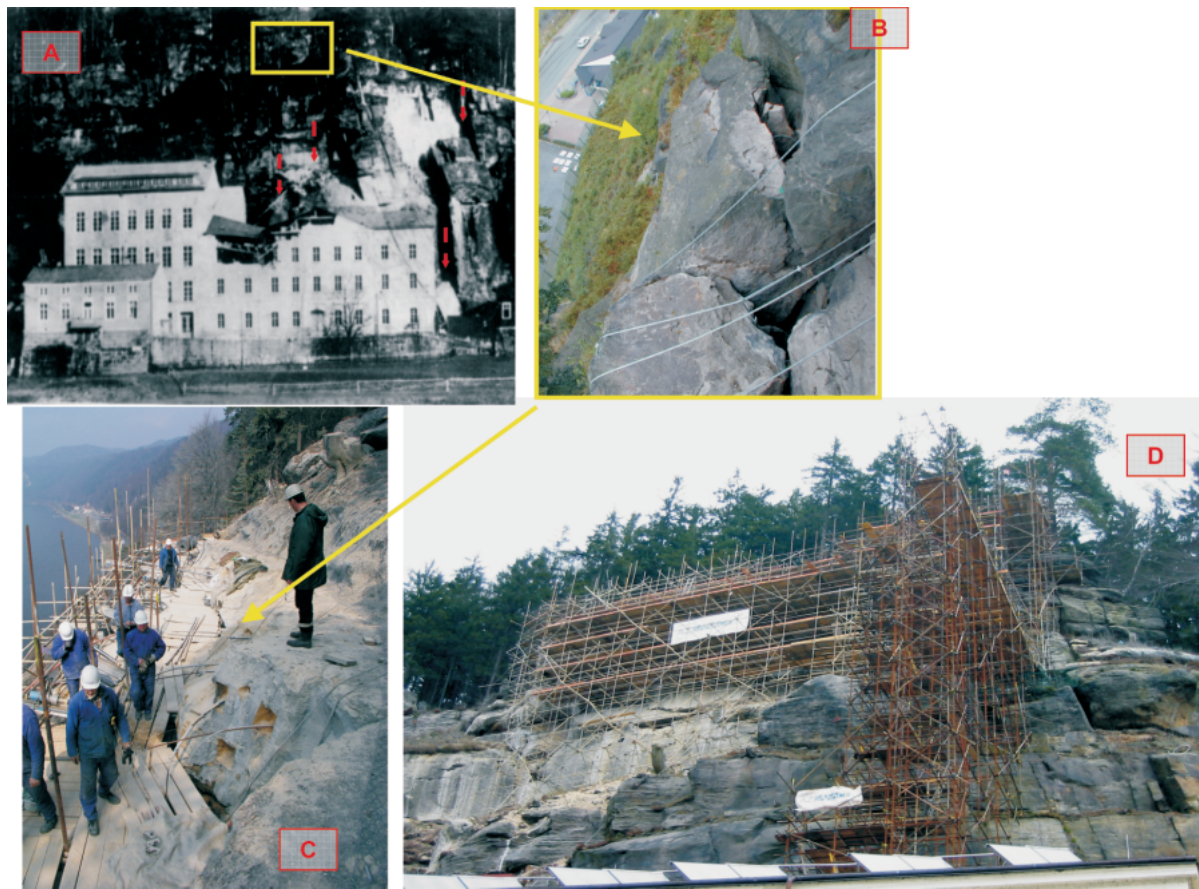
Site of repeated rock fall danger which required technically demanding remedial measures by anchoring in Hřensko Village. a Damaged roof and house walls by a 400 m³ rock fall in 1936. *Yellow box* marks the site of new, detailed photo b. b Fresh opening of joints by restored preparation activity, of another rock fall in late fall 2002. c The same site as on photo b under progress of remedial measures. d Heavy scaffolding was needed to realize anchoring works during winter 2002/2003
